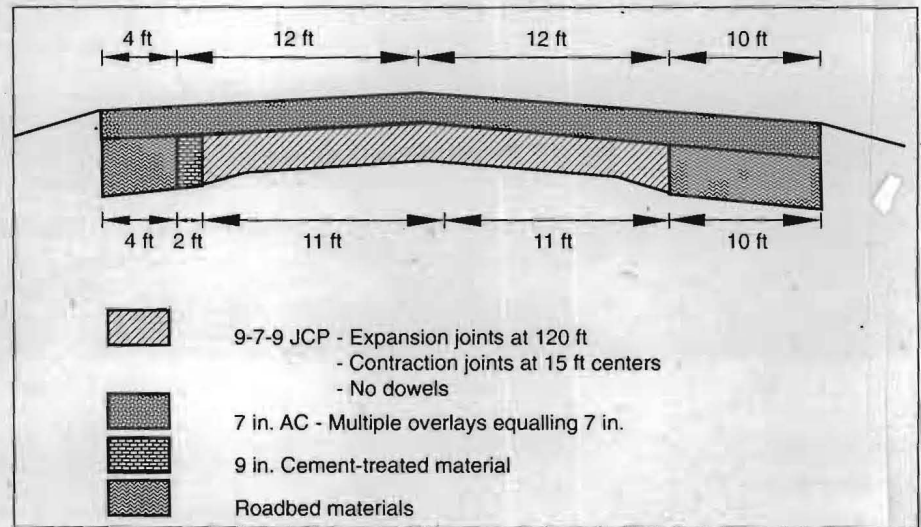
Typical cross section of US 59 (Polk Co.) test sections.
